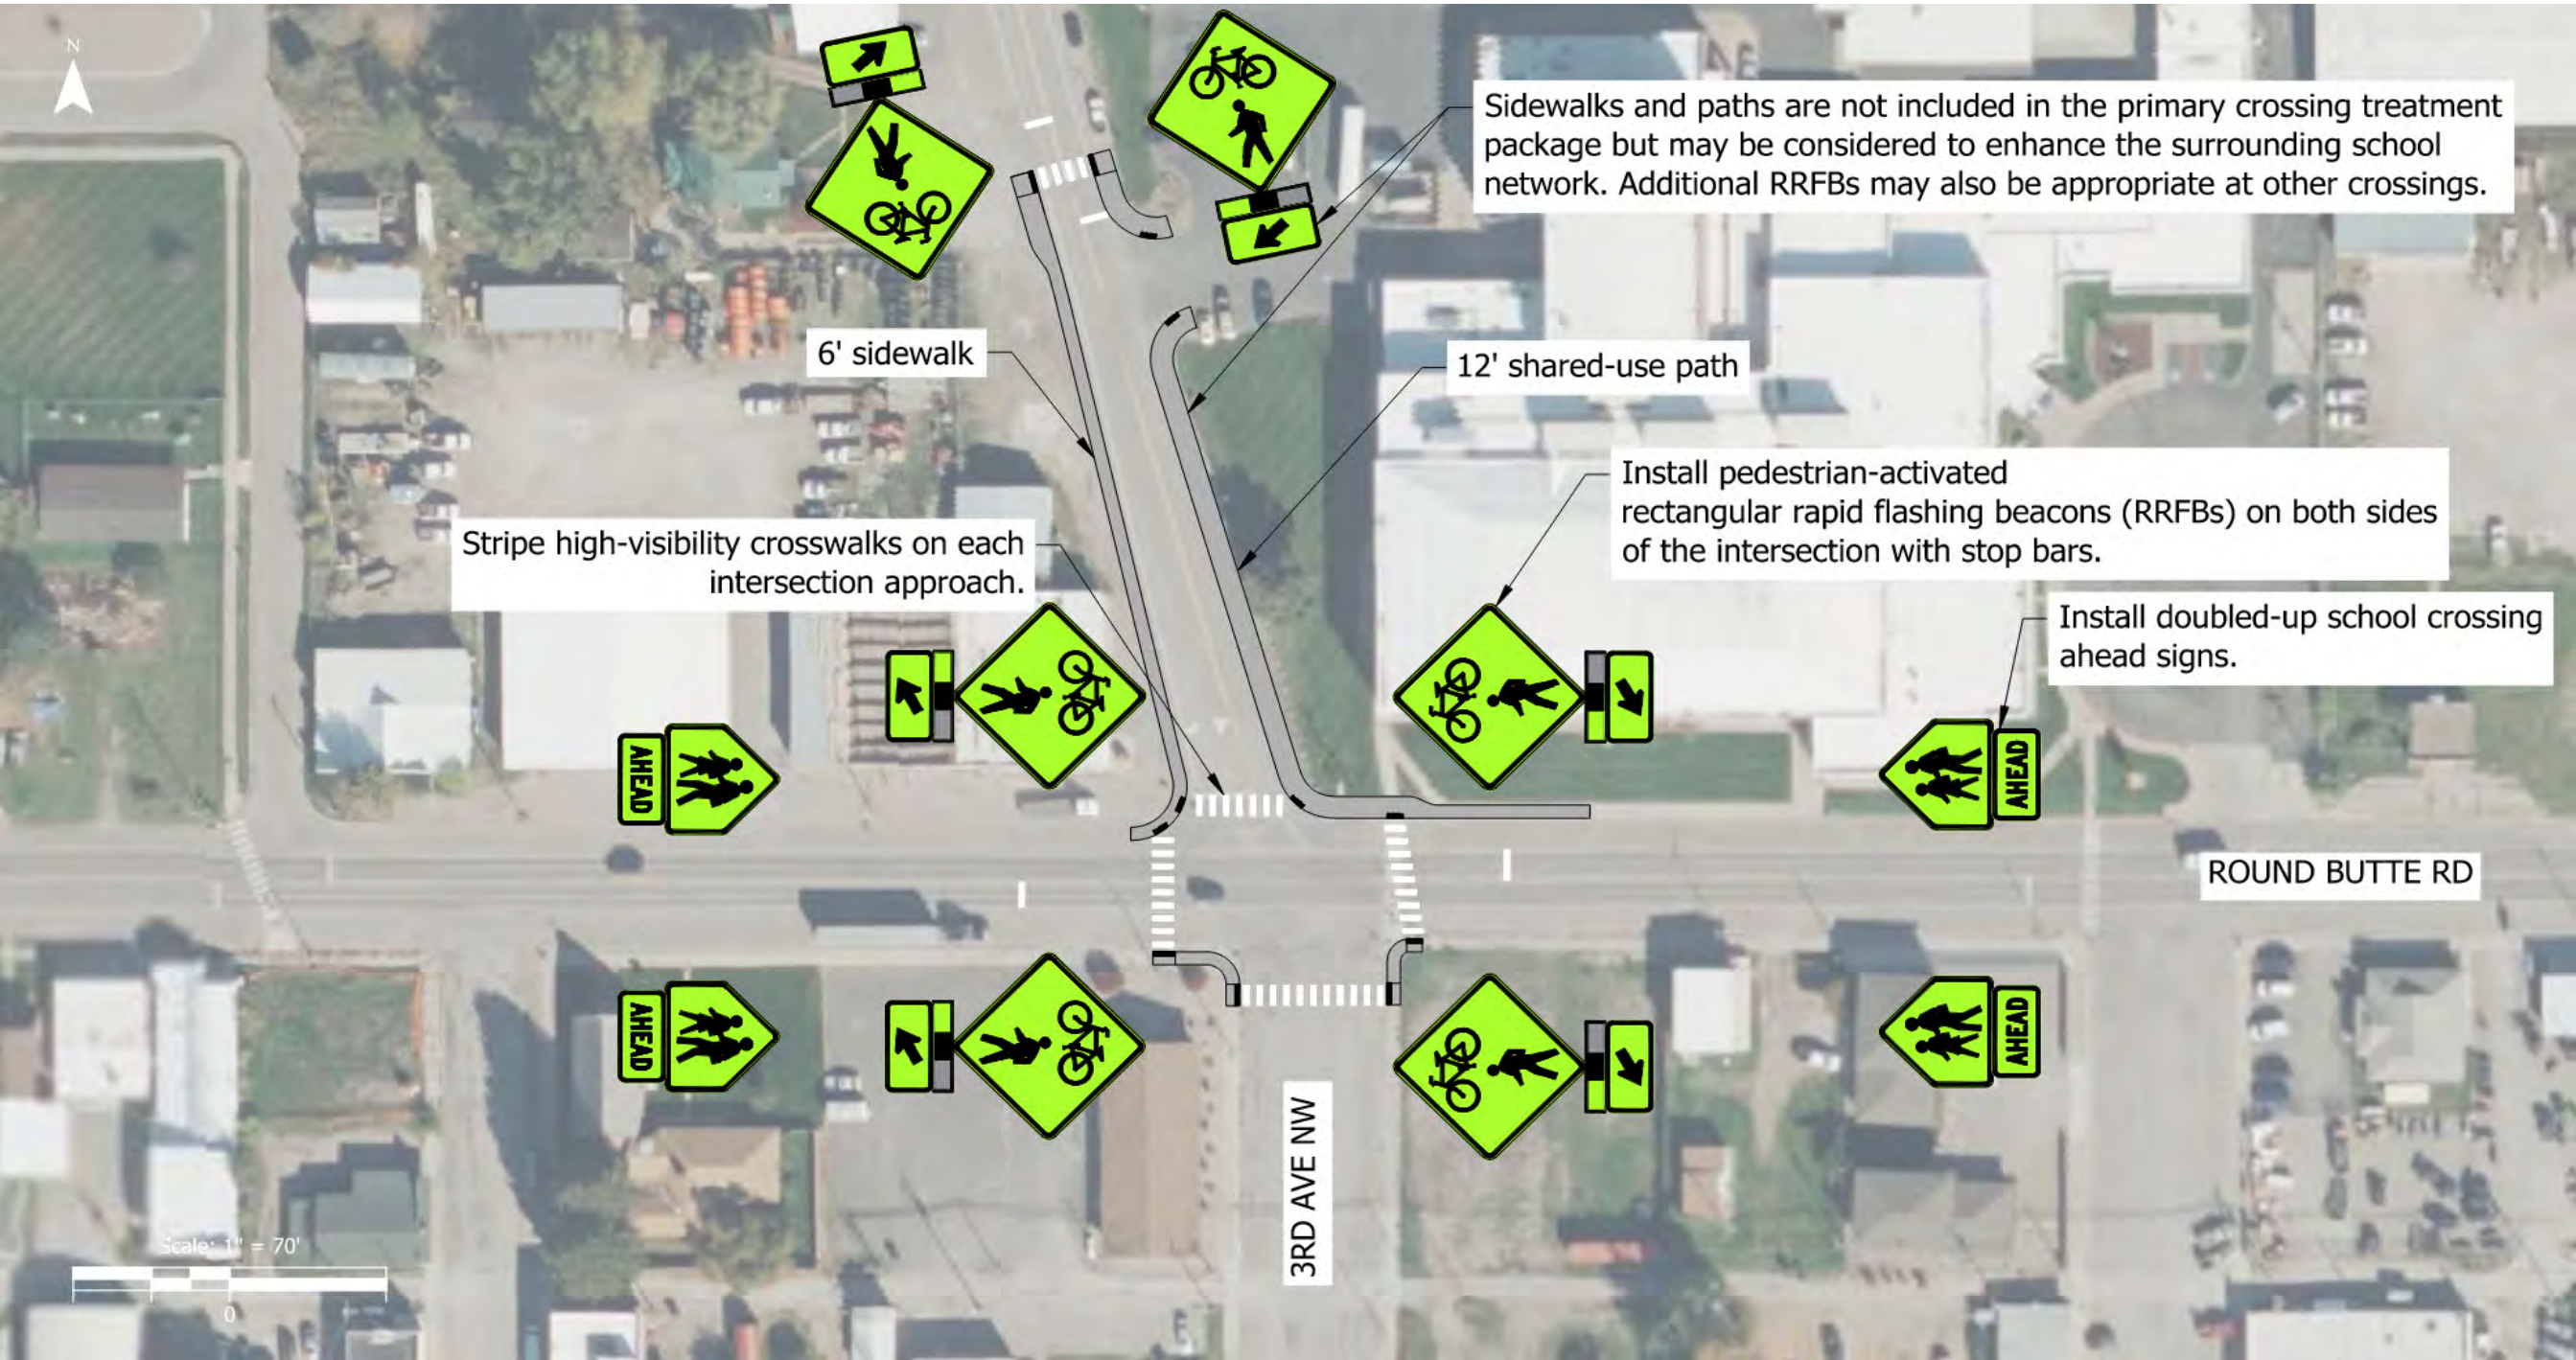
Example Application: Round Butte Road / 3rd Avenue North West (Ronan, MT)
